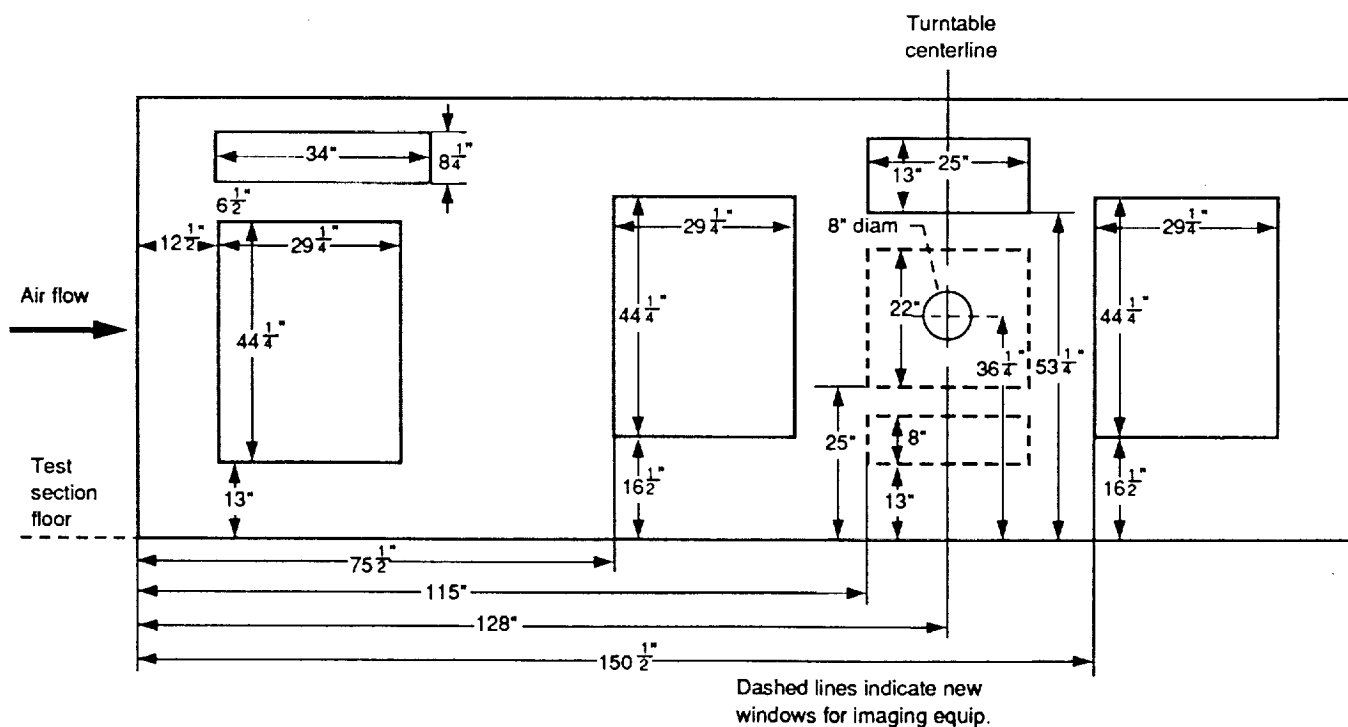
NASA Lewis Research Center IRT visual access control room - south wall side (looking into test section).
